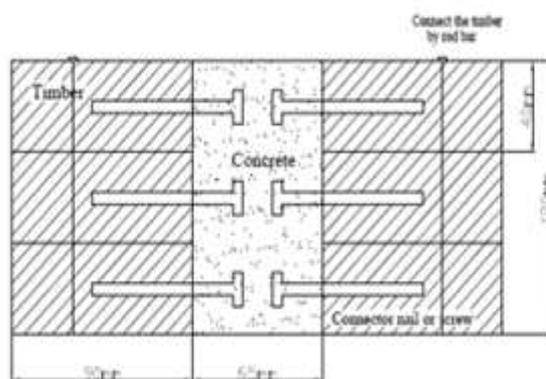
Push out test specimen plan view for Triple timbers (T3)
